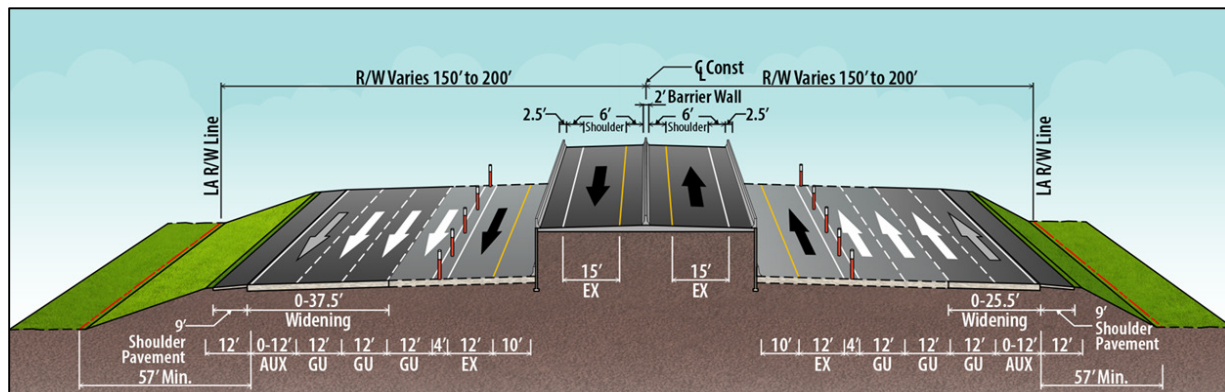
I-275 Mainline Starter Project Build Alternative Typical Section from Roosevelt Boulevard to south of 9th Street North (Segment C-SP2)
